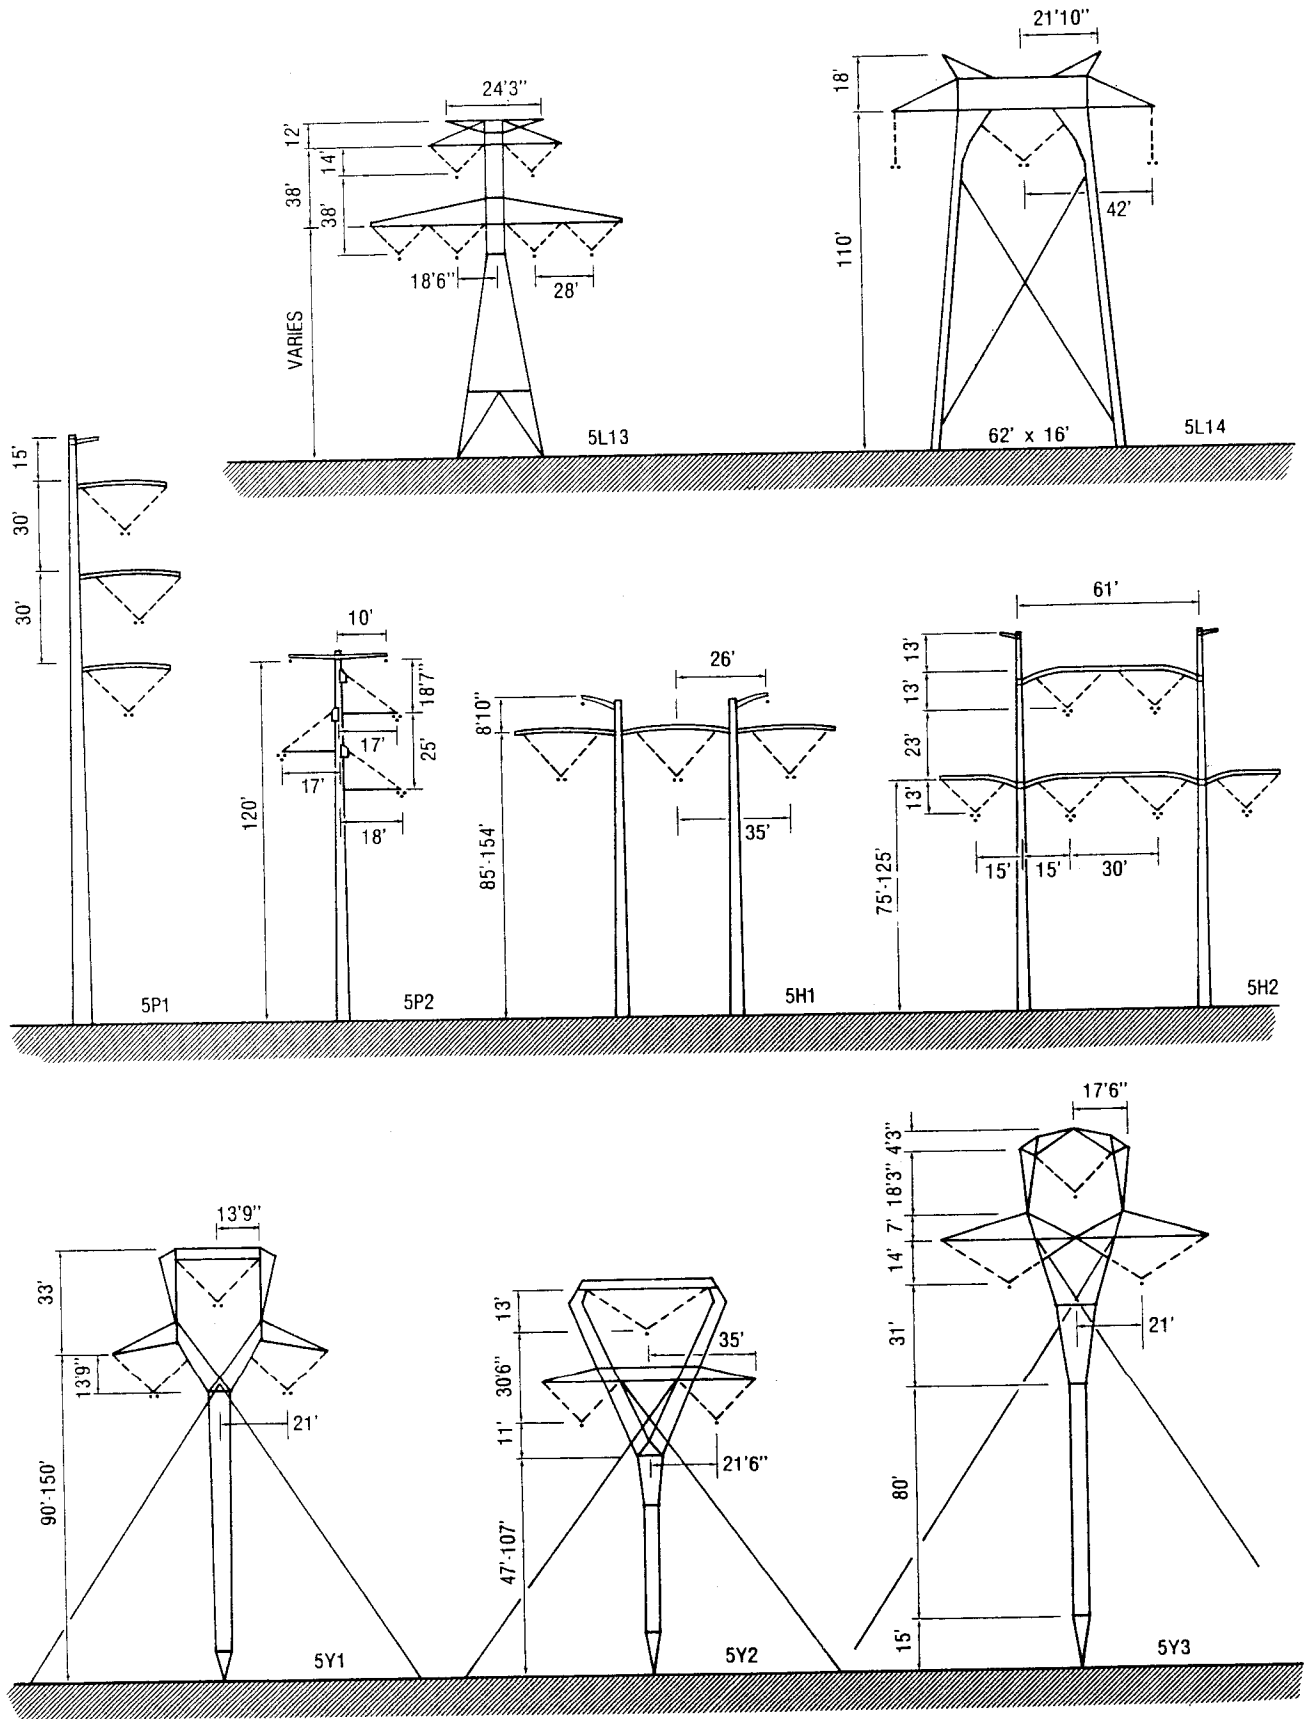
Typical 500-kV lattice-, pole-, H-frame-, and guyed Y-type structures used on present systems.
